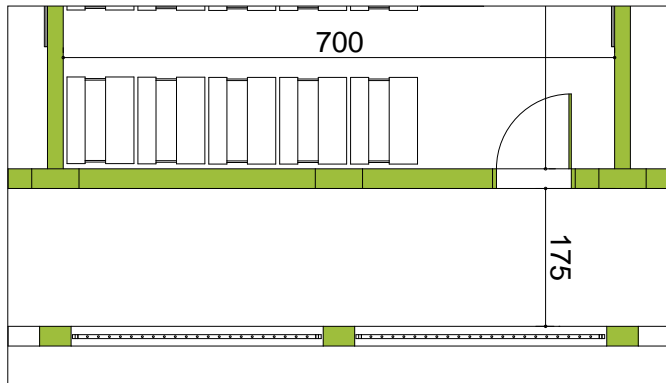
PU's second system of classroom wall (Jaramana First - First Floor)
